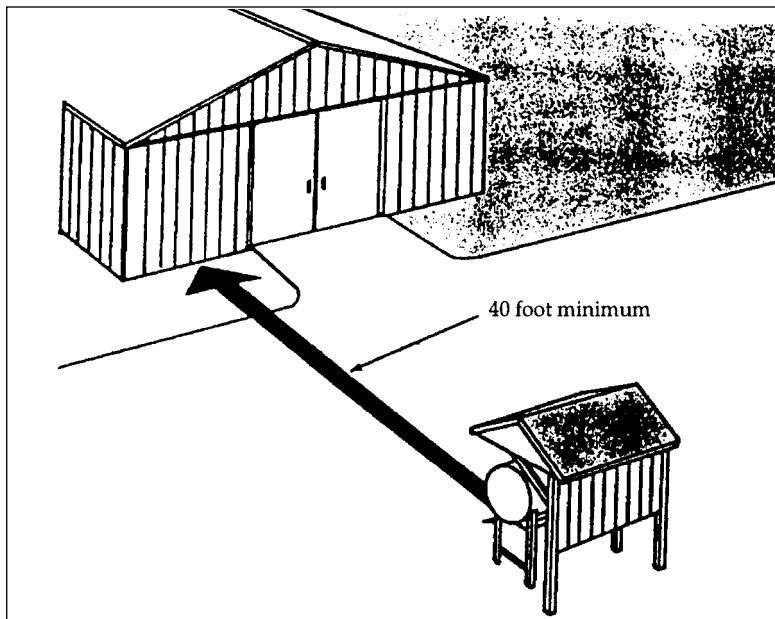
An aboveground gasoline storage tank must be 40 feet or more from the closest building.
